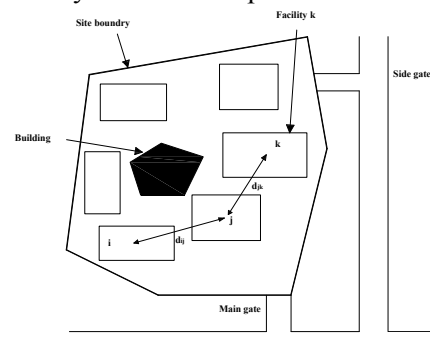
Layout Space Restriction (Lee and Love 1998)
